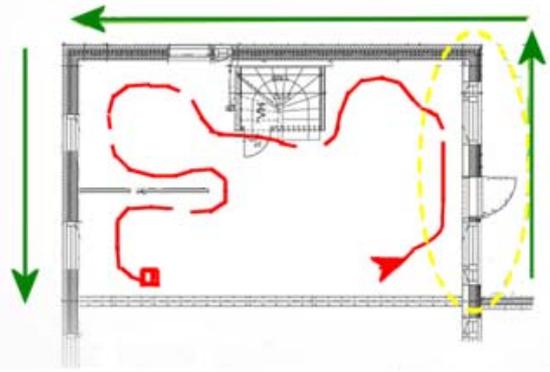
Example outdoor and indoor measurement routes along the building walls.
